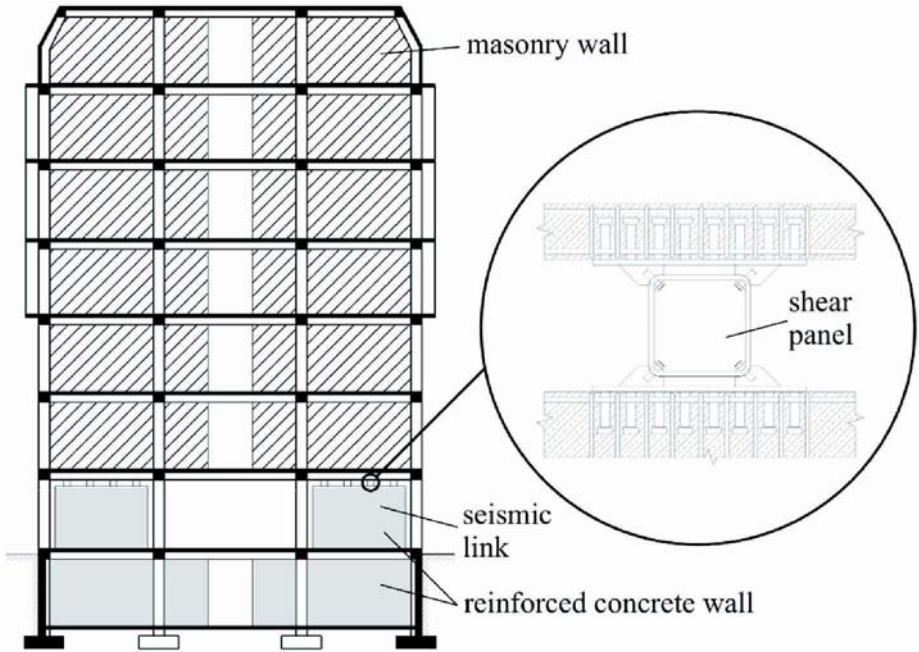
The building in Figure 7 re-designed as a Hyde system using only inexpensive masonry walls for stiffening the upper floors
